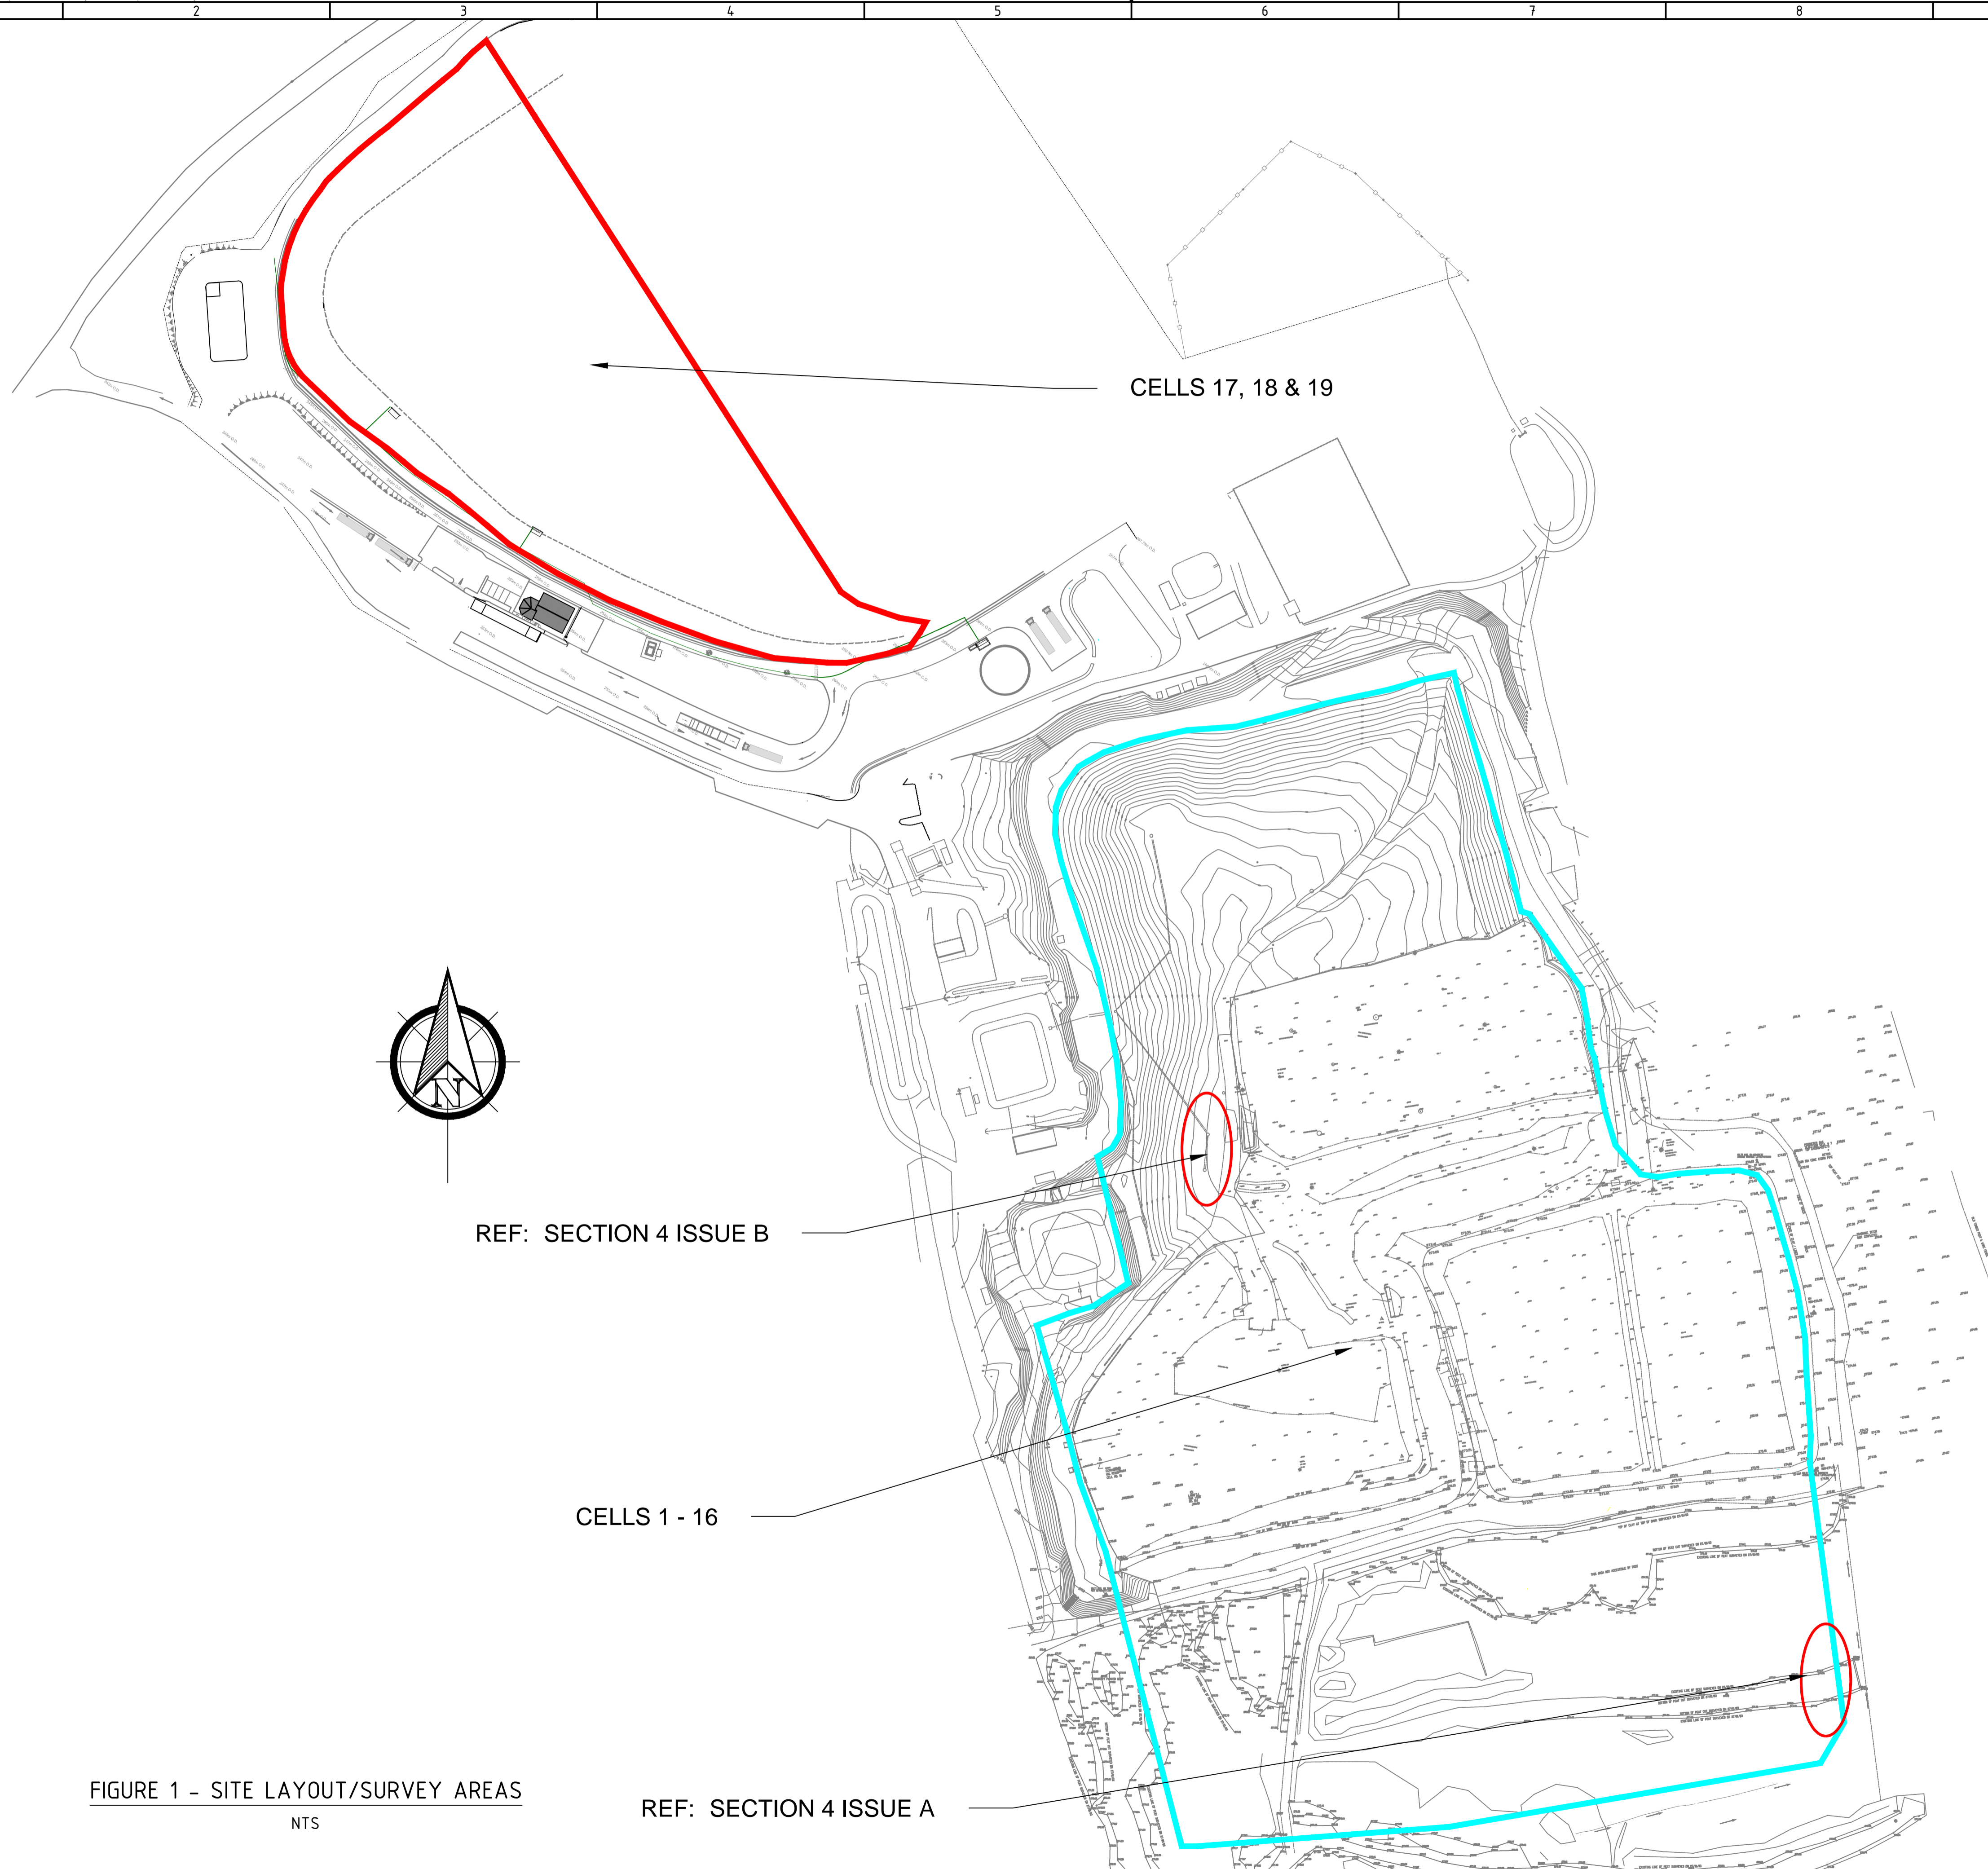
SITE LAYOUT/SURVEY AREAS
